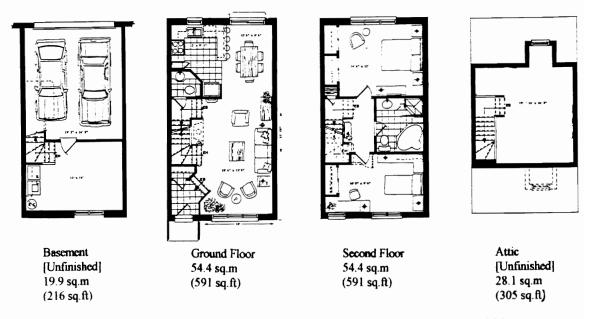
House with unfinished space (Source: Montclair Inc, 1988)
